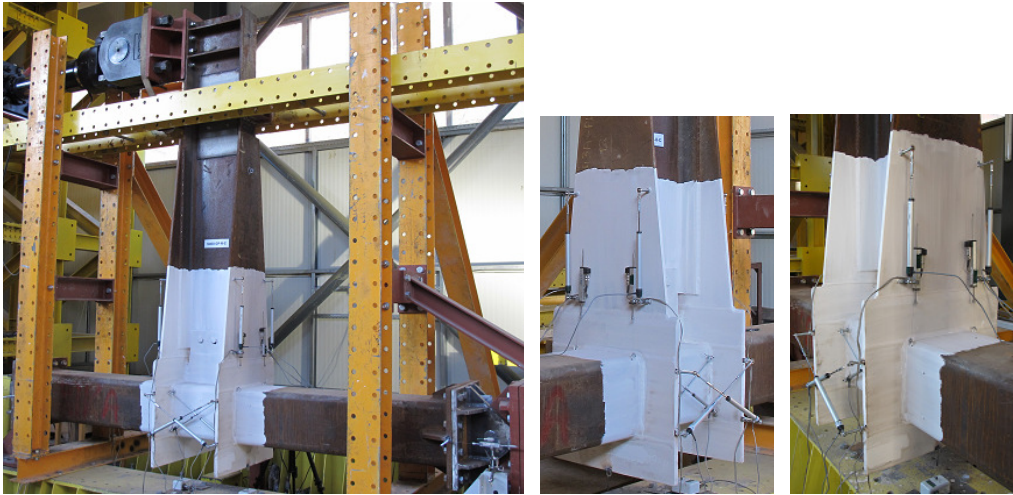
S460-CP-R test assembly and connection zone – before test
